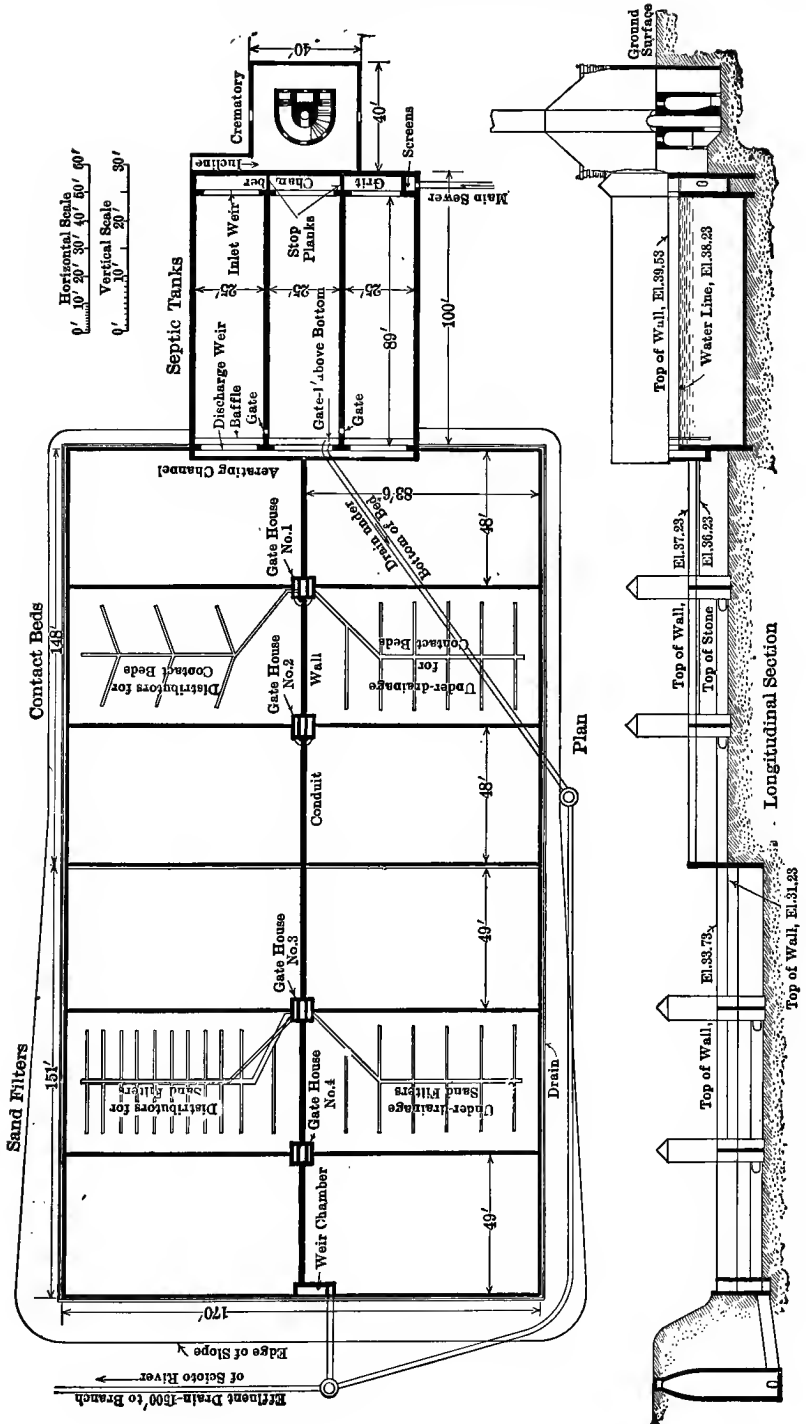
PLAN AND SECTION OF SEWAGE TREATMENT PLANT AT MARION, O.
